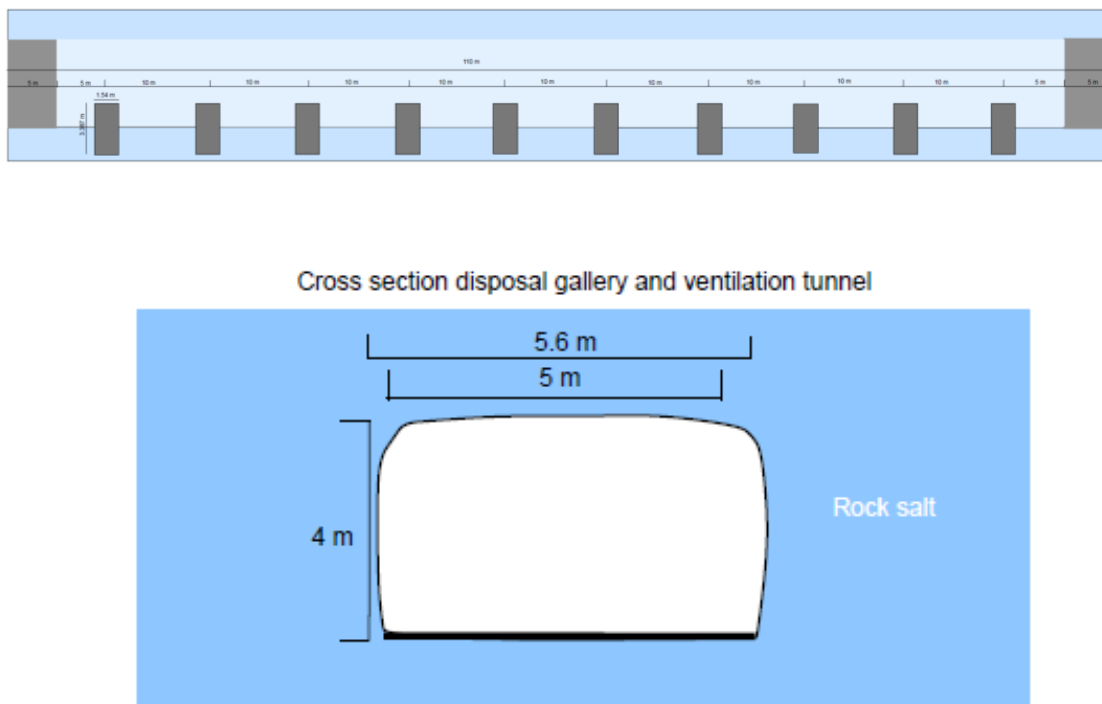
Cross sections of the disposal tunnel in the lower level of the repository and the planned arrangement of containers within it. (From COVRA - "Lower_Level_Disposal_Concept.pdf")
